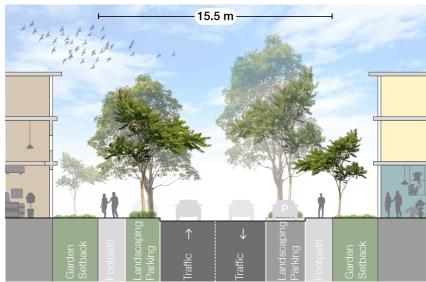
Area 4 - Typical Street with Parking on Both Sides
